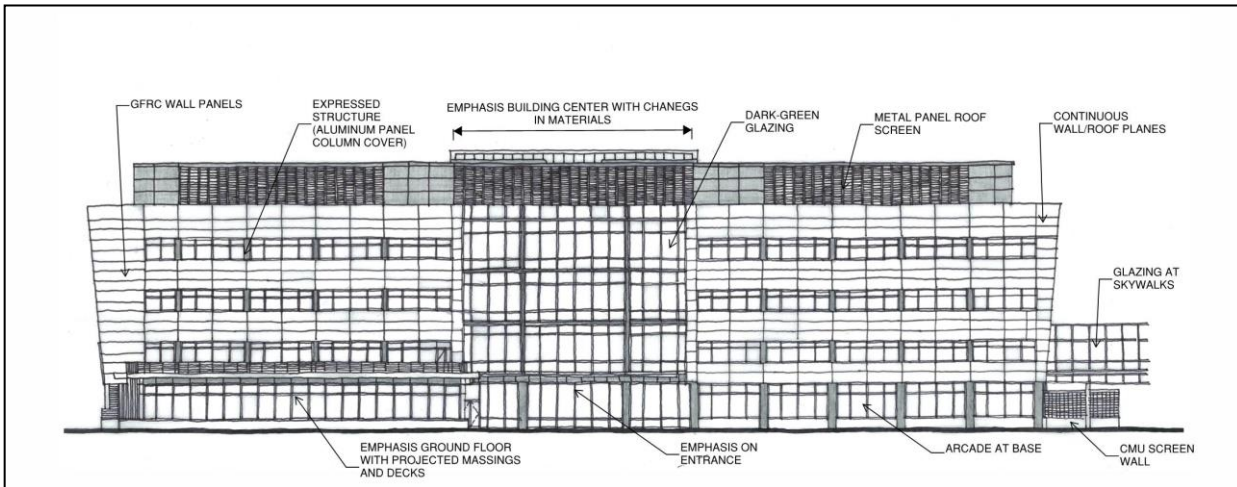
Building Façade examples – Elevation of NLB 1 at Gilead Campus
